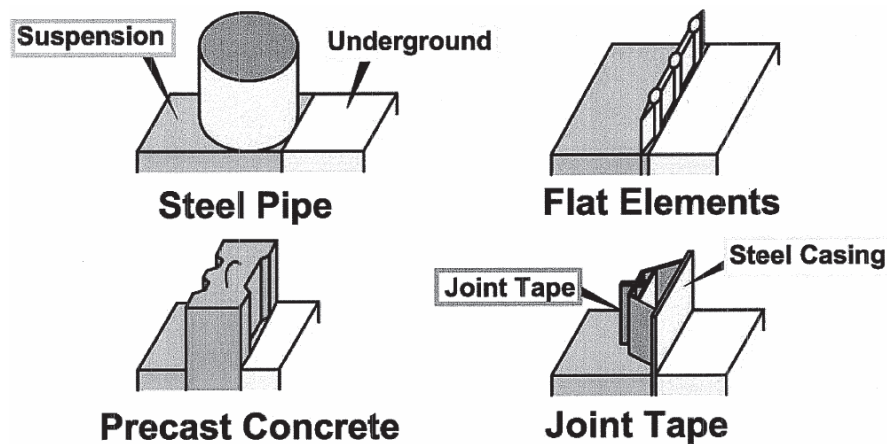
Example of vertical joint details for diaphragm walls, modified from Alén et al. (2006)
